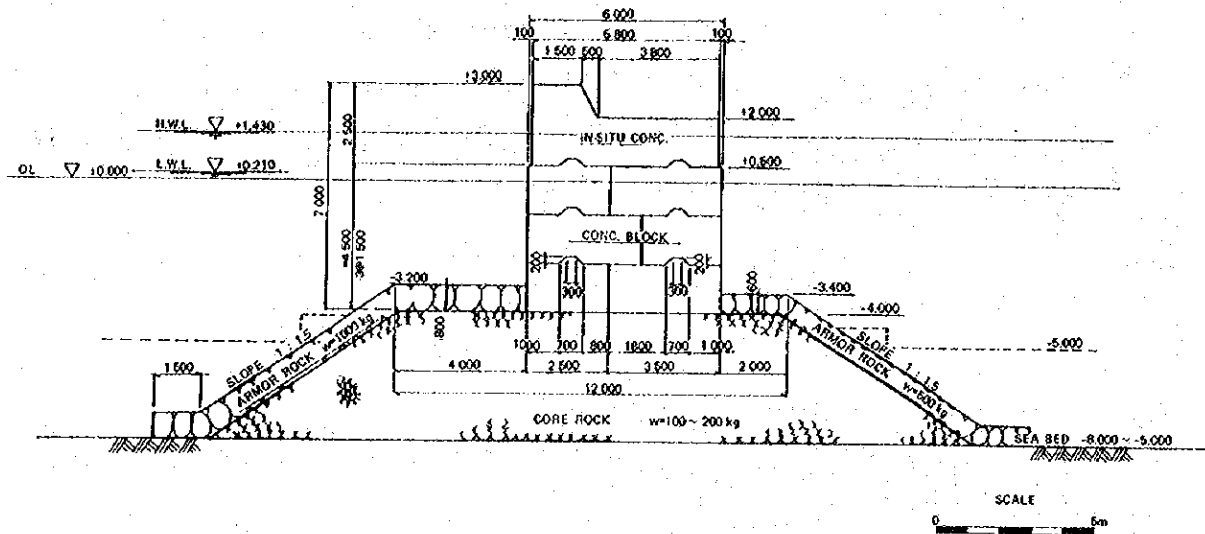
Cross Section of Breakwater (4) – Lucena Port
